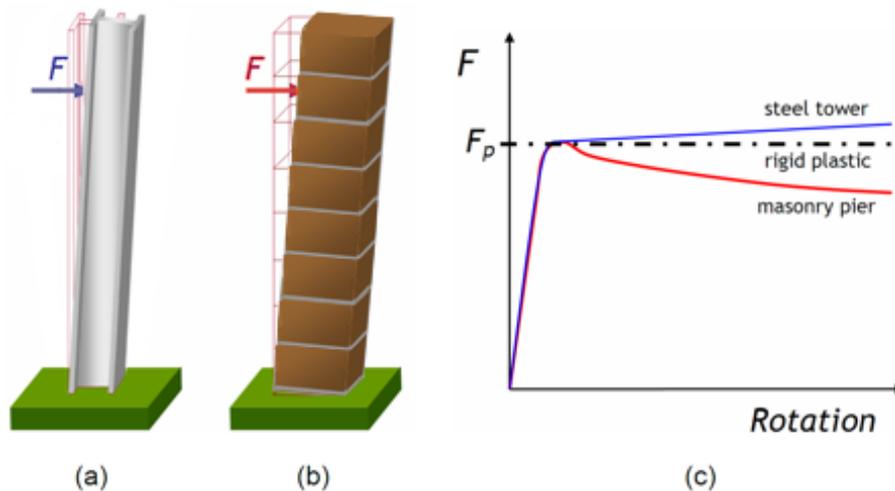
Laterally loaded (a) steel column; (b) masonry pier; and (c) idealized response curves
